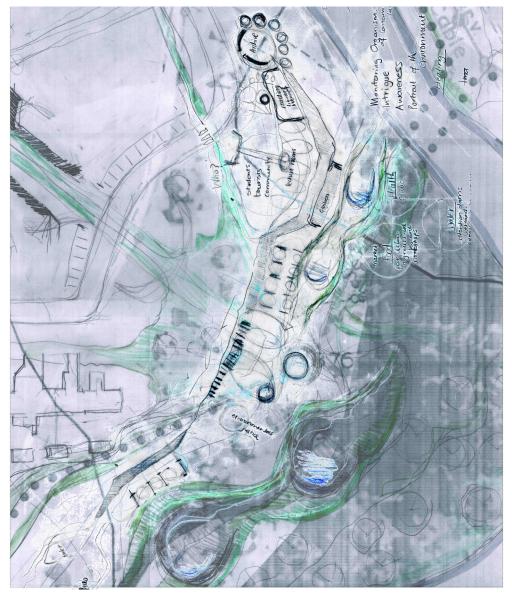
Site plan sketch responding to existing wetland. (Author, 2016)
